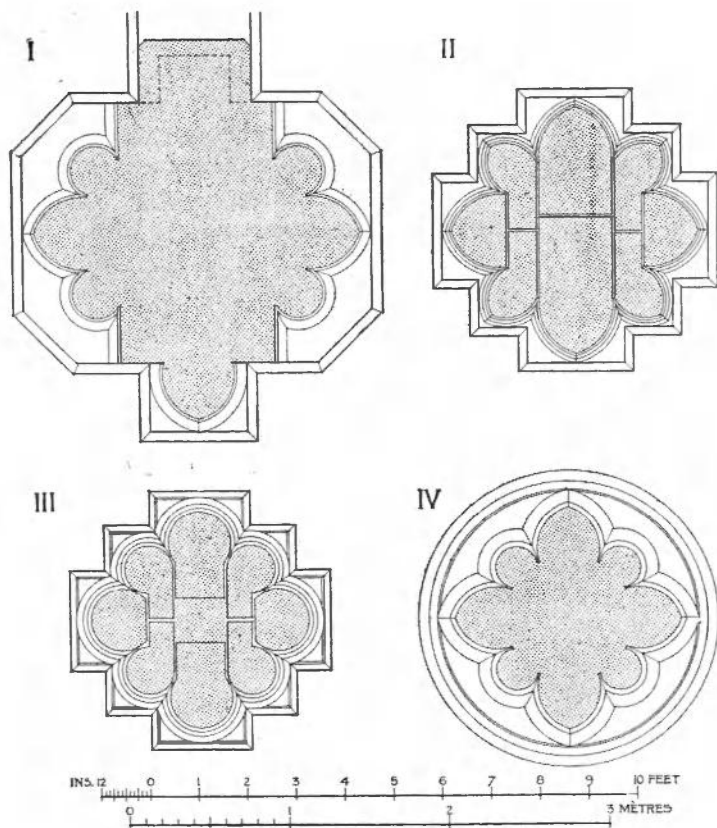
FIG. I. KIRKSTALL, PLANS OF NAVE PIERS.
